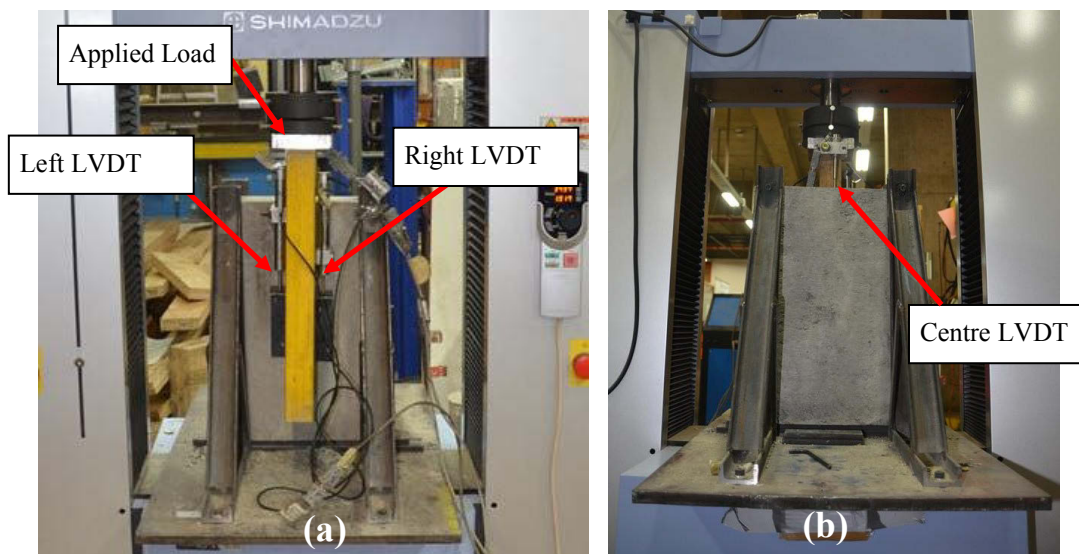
Set-up of a specimen in the test rig: (a) front and (b) back views
